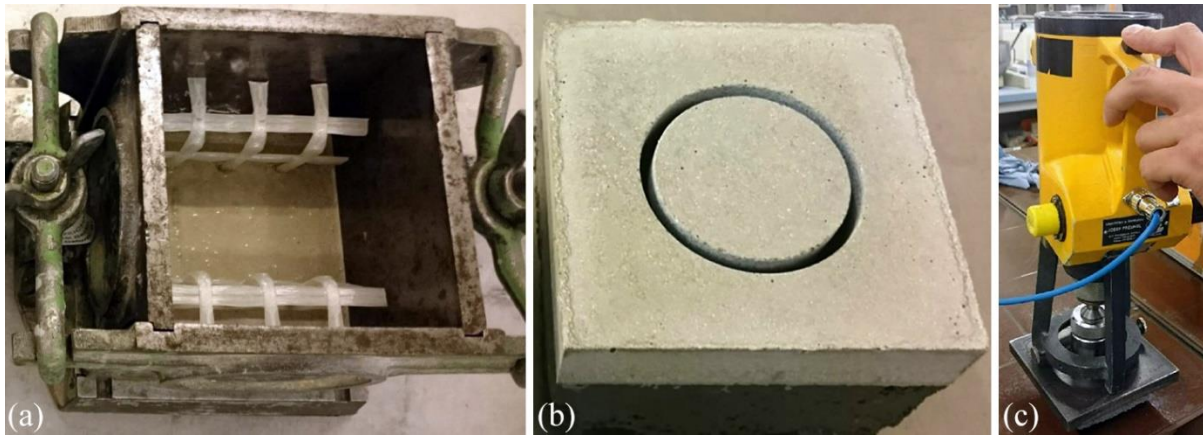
Tensile bond strength test (a) casting with rough surface (b) specimen (c) testing
